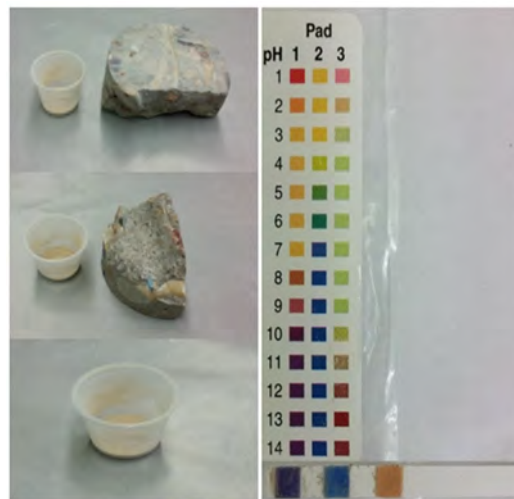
Concrete pH measurement: ground concrete from extracted cores (left) and pH evaluation using the pH strip (right)
